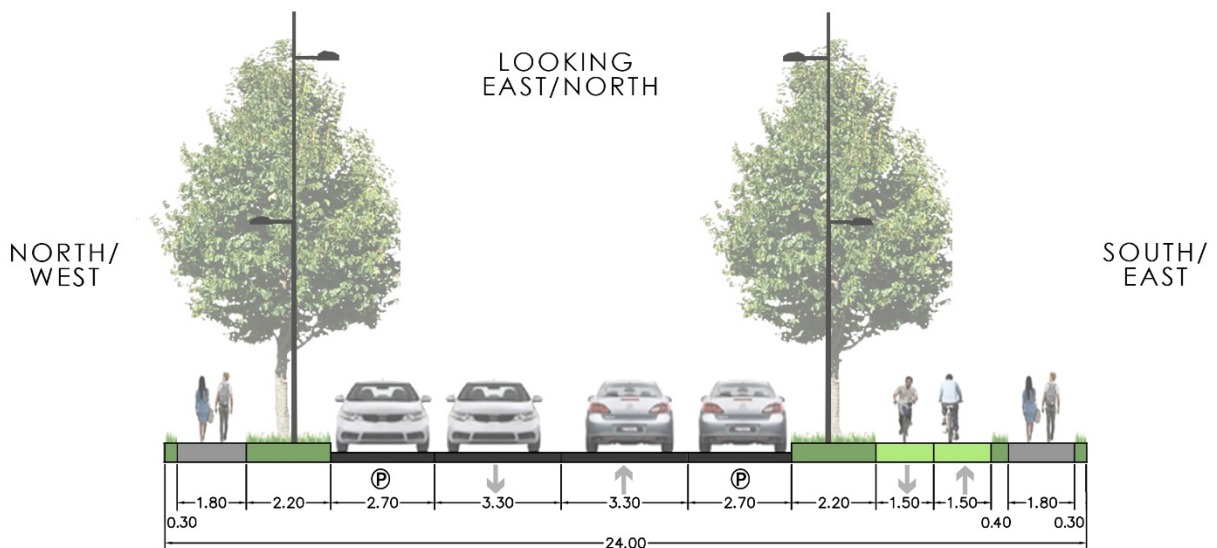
A: OAK STREET, BRENTWOOD BOULEVARD NORTH AND GATEWOOD BOULEVARD (24 M)
